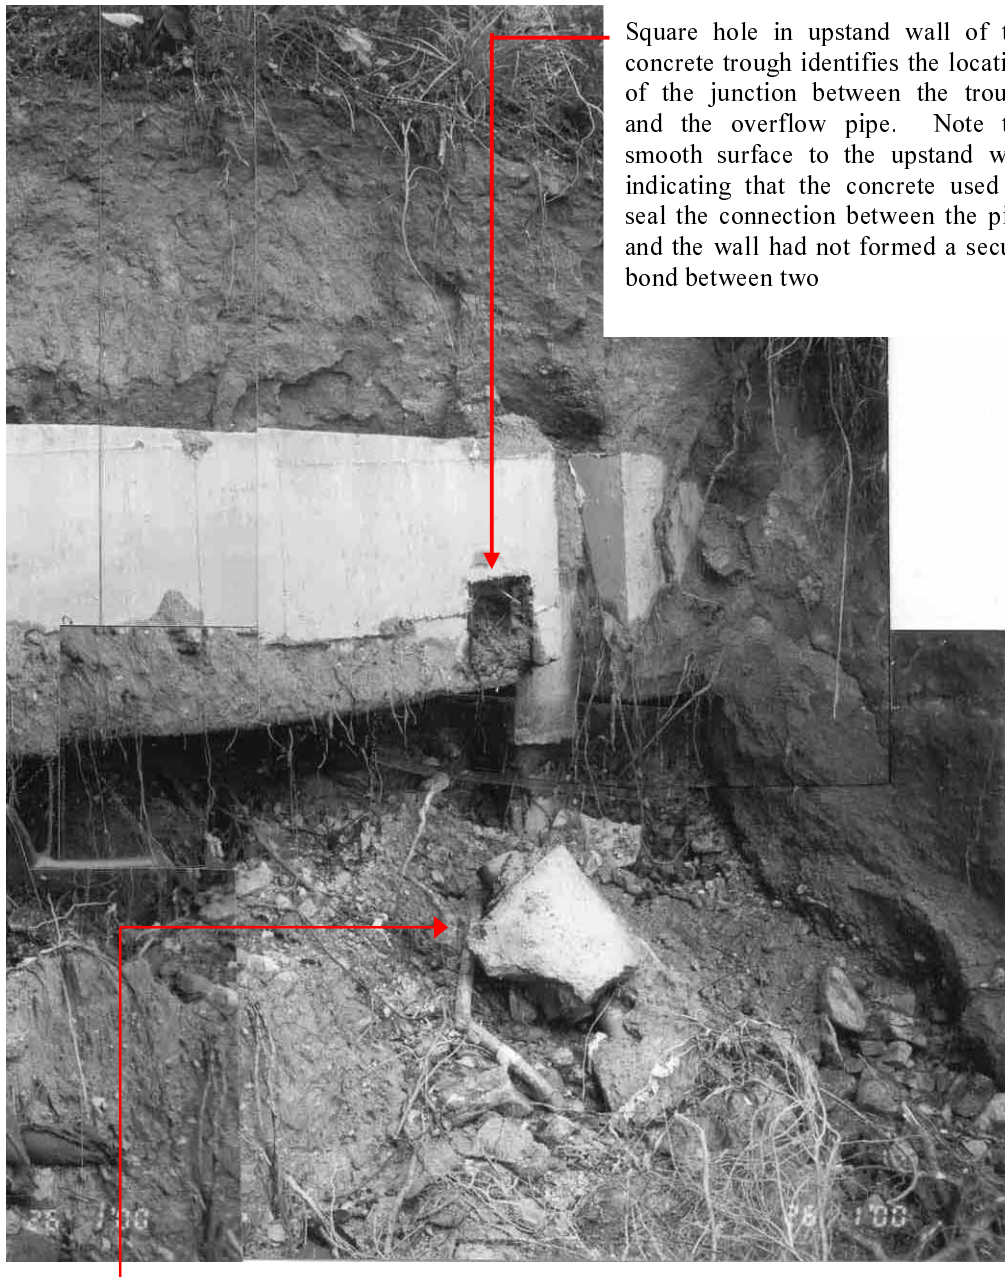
Tilted Upstand Wall at the Toe of the Lowest Batter
